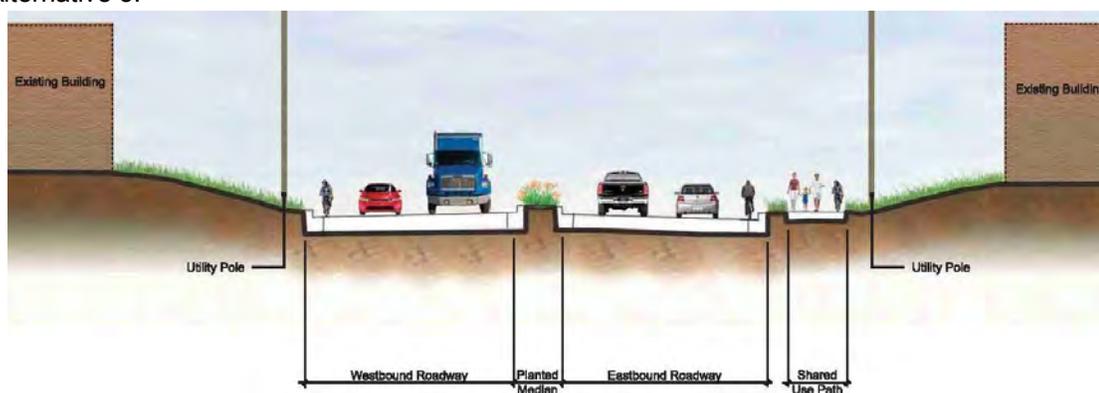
Alternative 3 Access Management Option Improvement Segment C Typical Section
